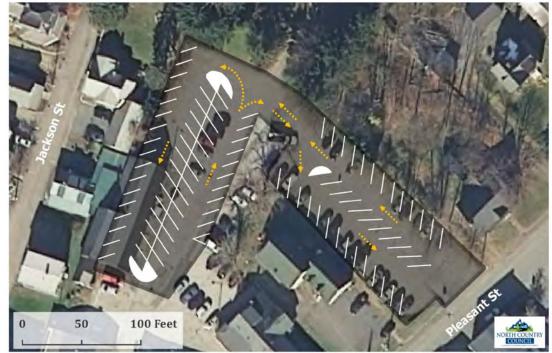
Concept for a potential reconfiguration of the Pleasant Street-West parking lot. Use of angled parking and one-way travel aisles may allow for additional rows of parking stalls to be added. Note: this is a planning-level concept, and is not intended to serve as an engineering design.
